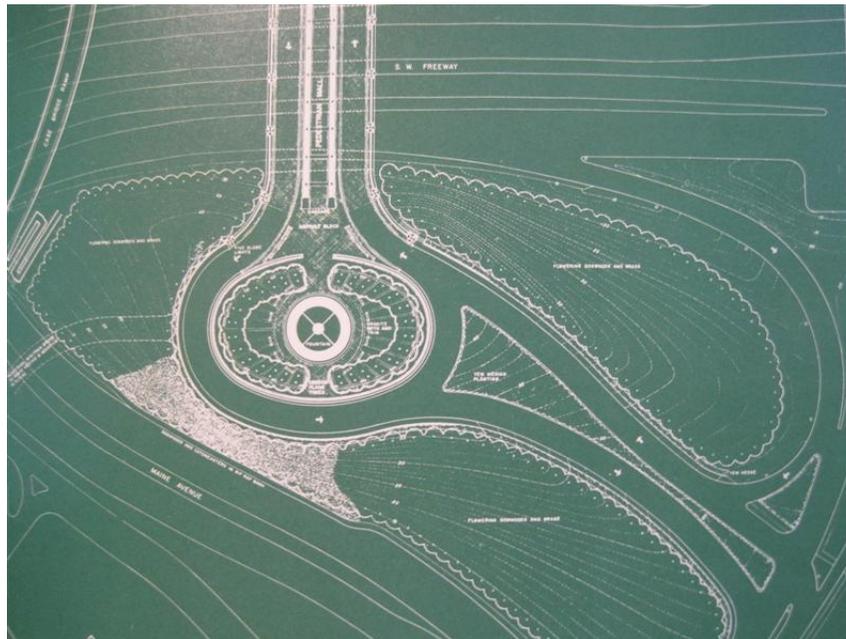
Plan of Dan Kiley's Landscape for Banneker Park
